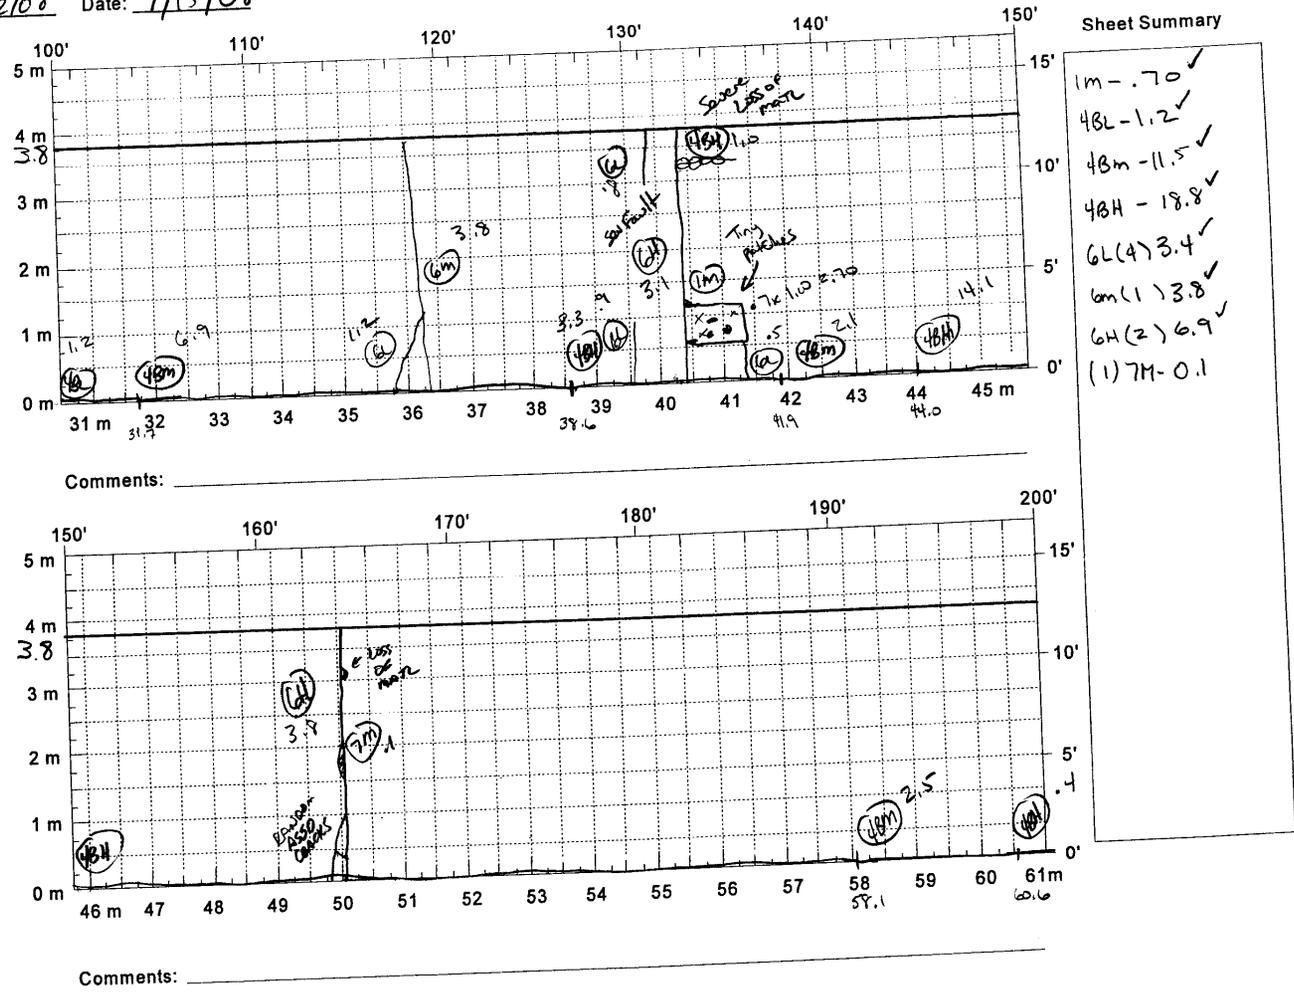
Pavement Distress Map; Station 1+00 to 2+00; Section 0506.
